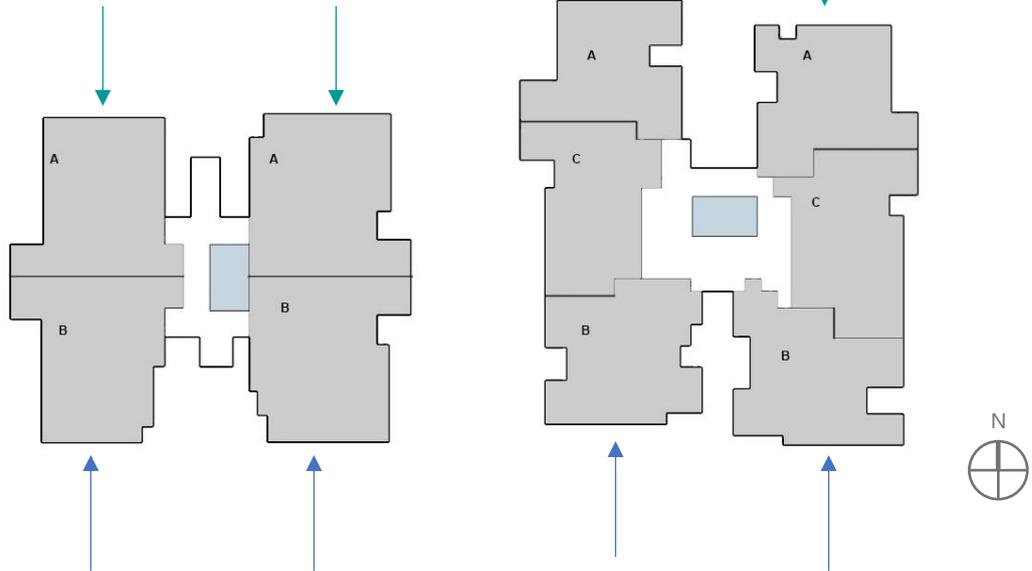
Building layout showing all dwelling units with window openings facing the north and south direction. In this instance, all units can be considered meeting the requirement.
